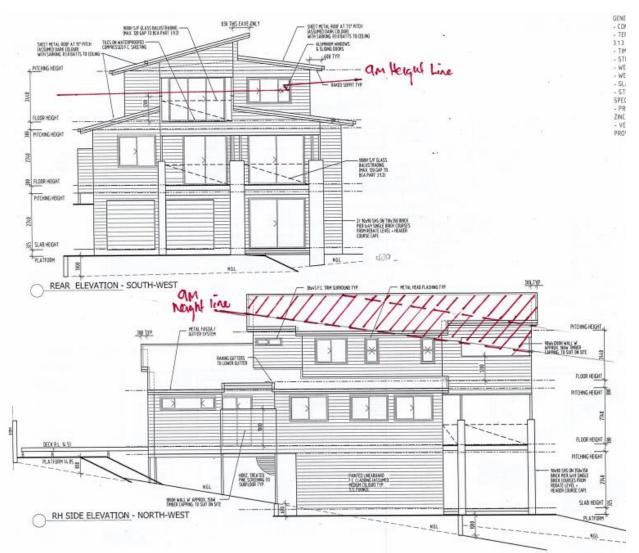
Side elevation showing slope of land and encroachment of part of building above the 9m height limit.
